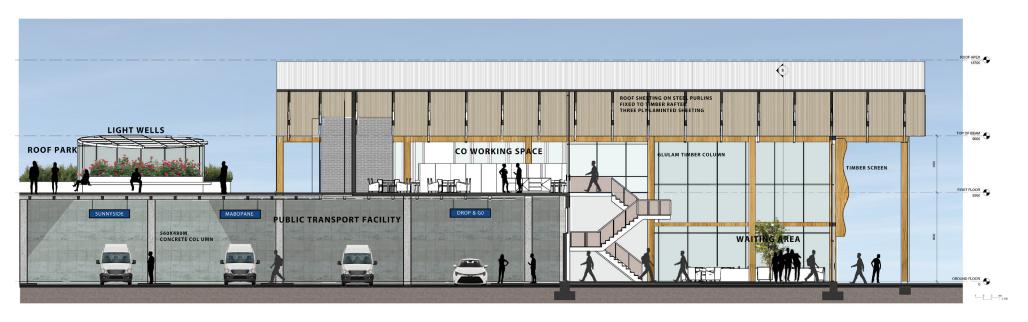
Cross section A-A through interchange of final design (Masu 2023)
